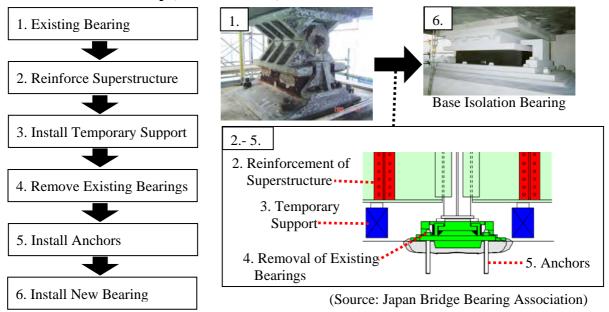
Construction Steps of Bearing Replacement
